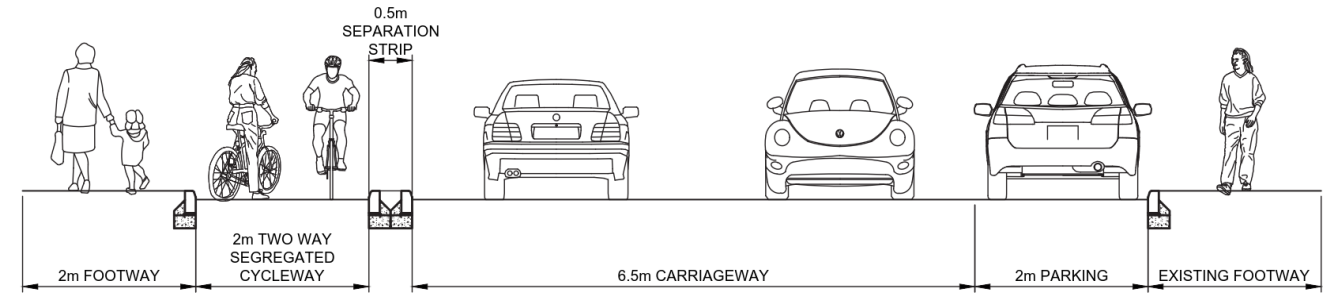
Cross Section Route 1 - North High Street, New Street to Brunton Hall
